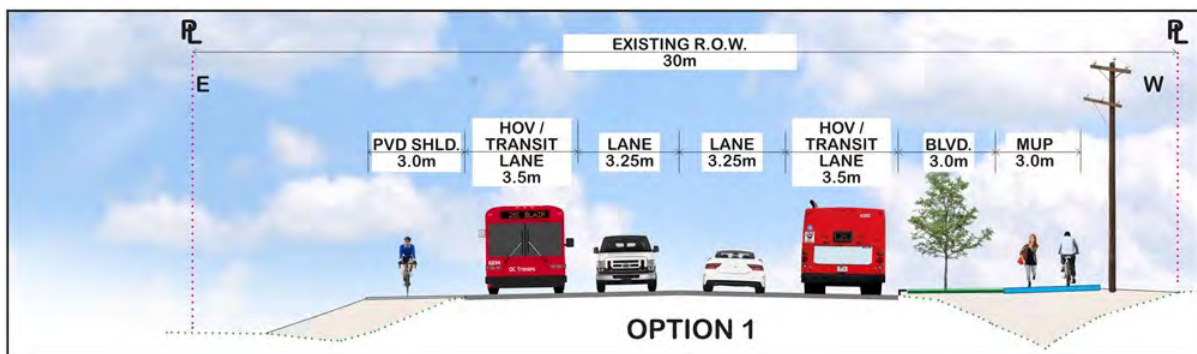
Option 1 – West Side MUP and Boulevard/East Paved Shoulder
